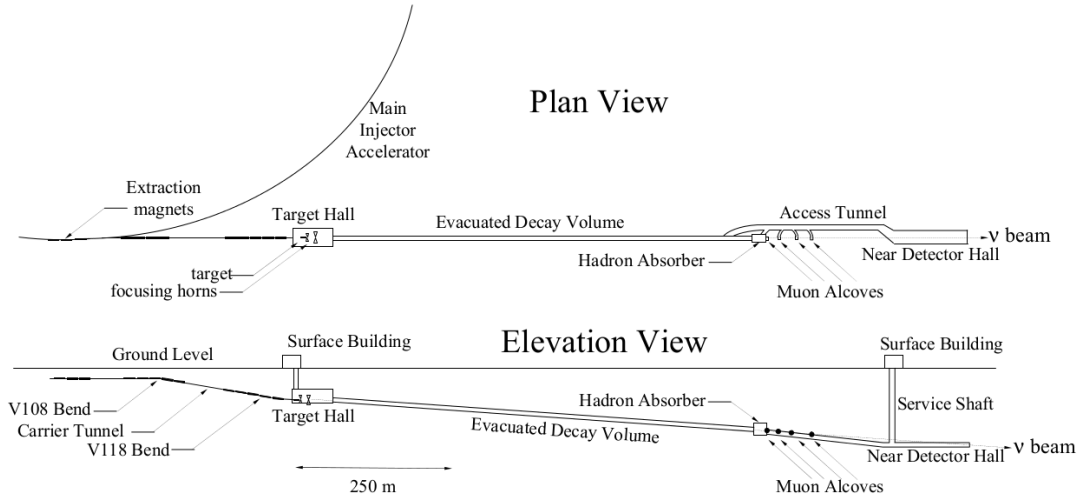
A scale diagram of the NuMI beamline. Plan and elevation views of the NuMI beam facility [34].
